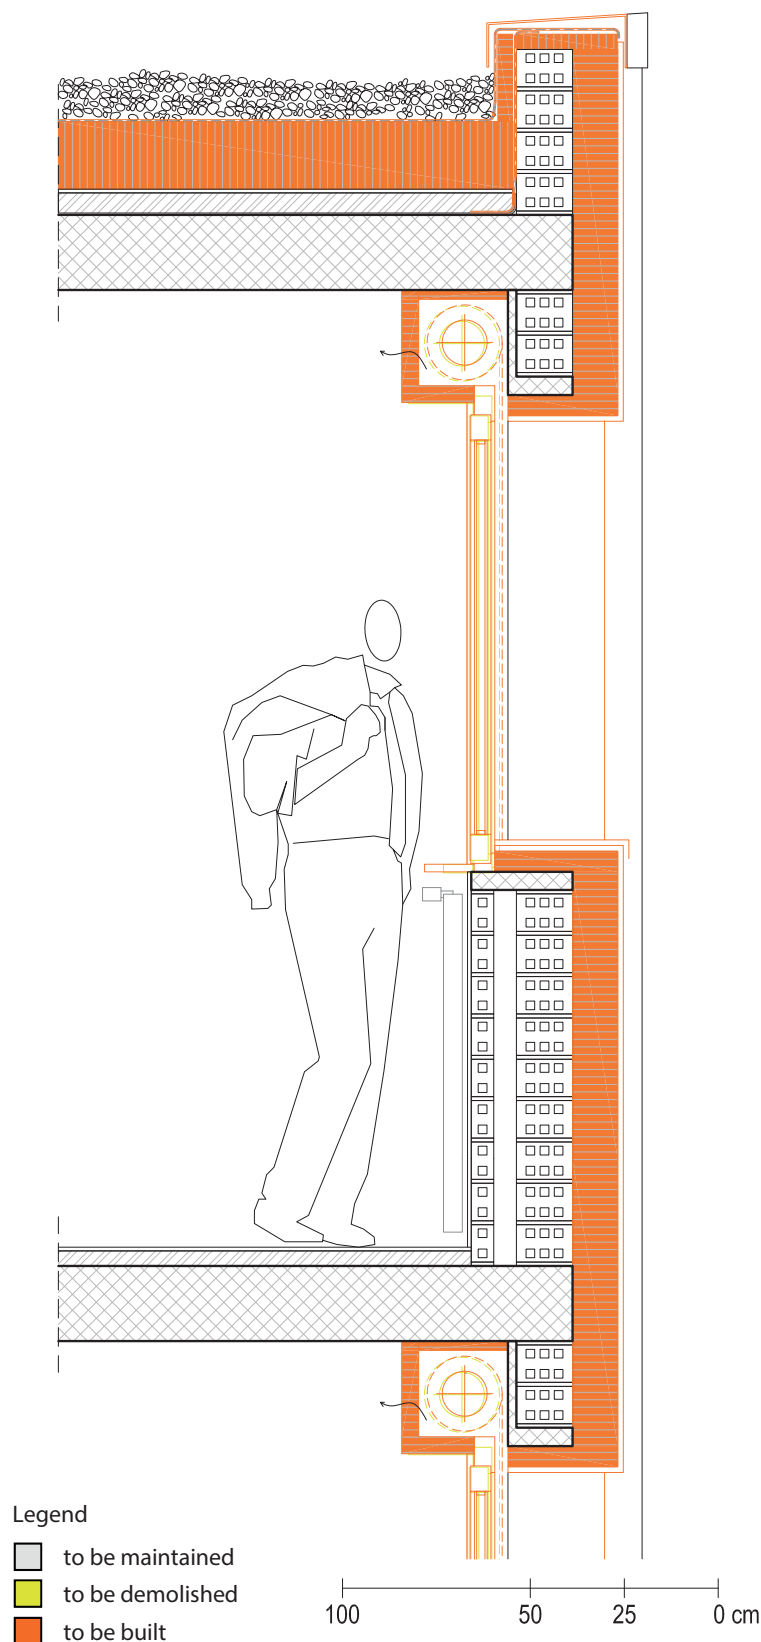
Façade constructive detail, S0 - Baseline, Archetype 3.
